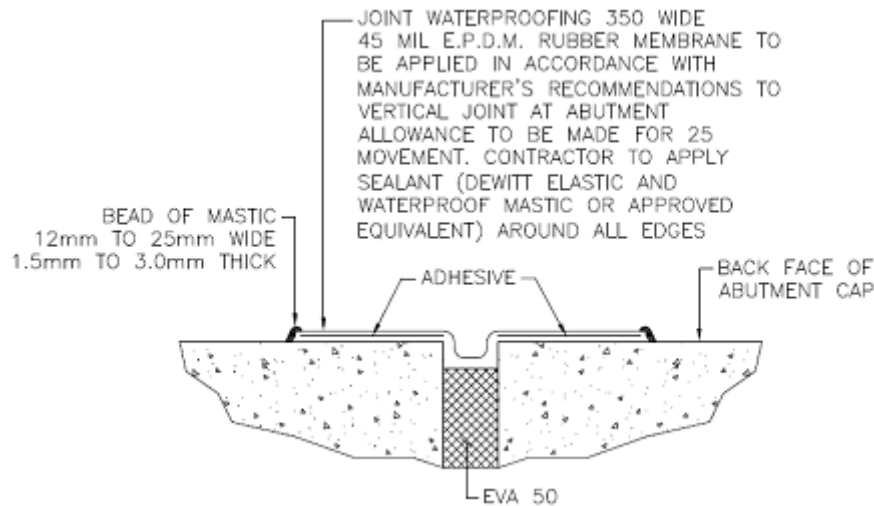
Plan on abutment joint seal (extract from Structures design submission)
